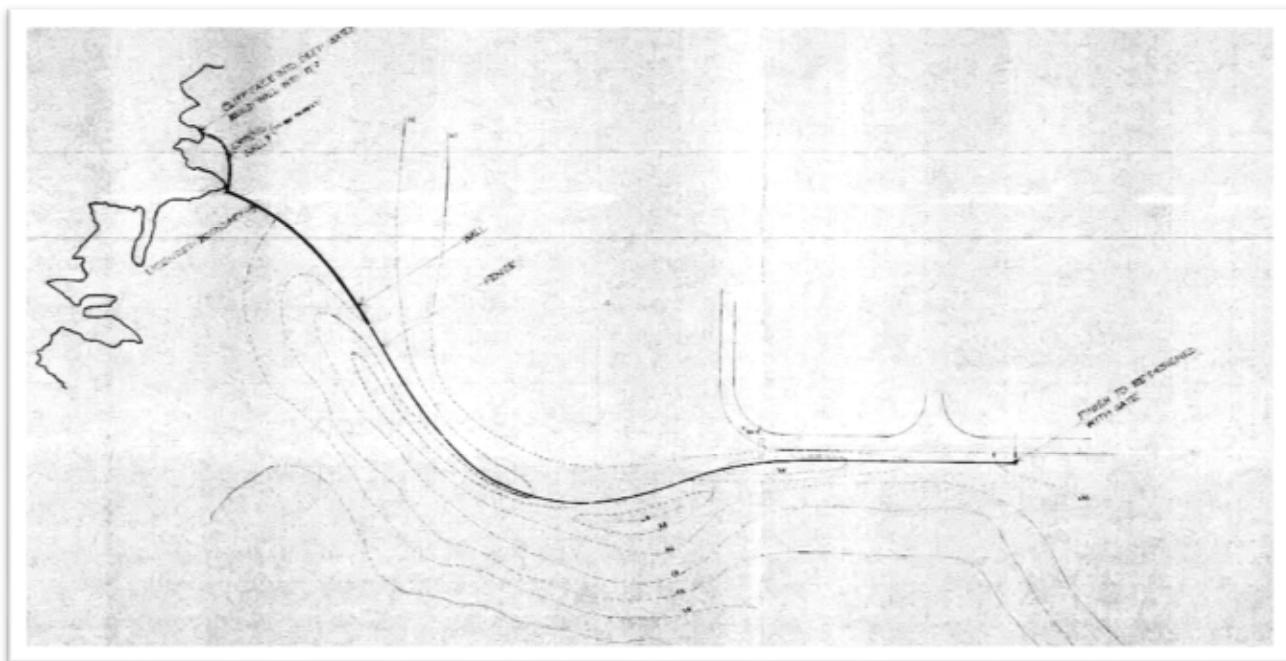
Crowe's south boundary contours and wall plan (Sylvia Crowe and Associates, 1966).
